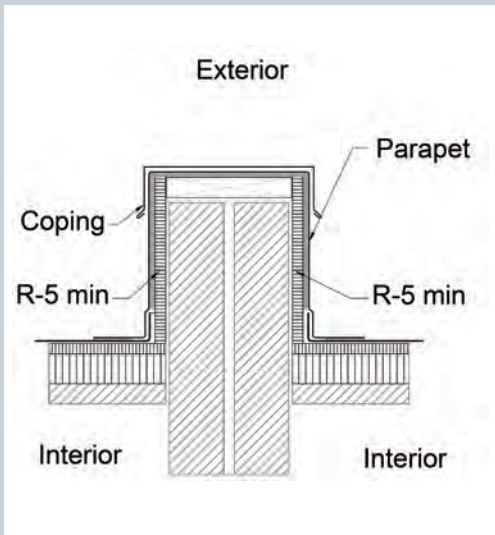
The second of two configurations in ASHRAE 90.1-2022 Section 5.5.5 that addresses thermal bridging for new roof system installations.
